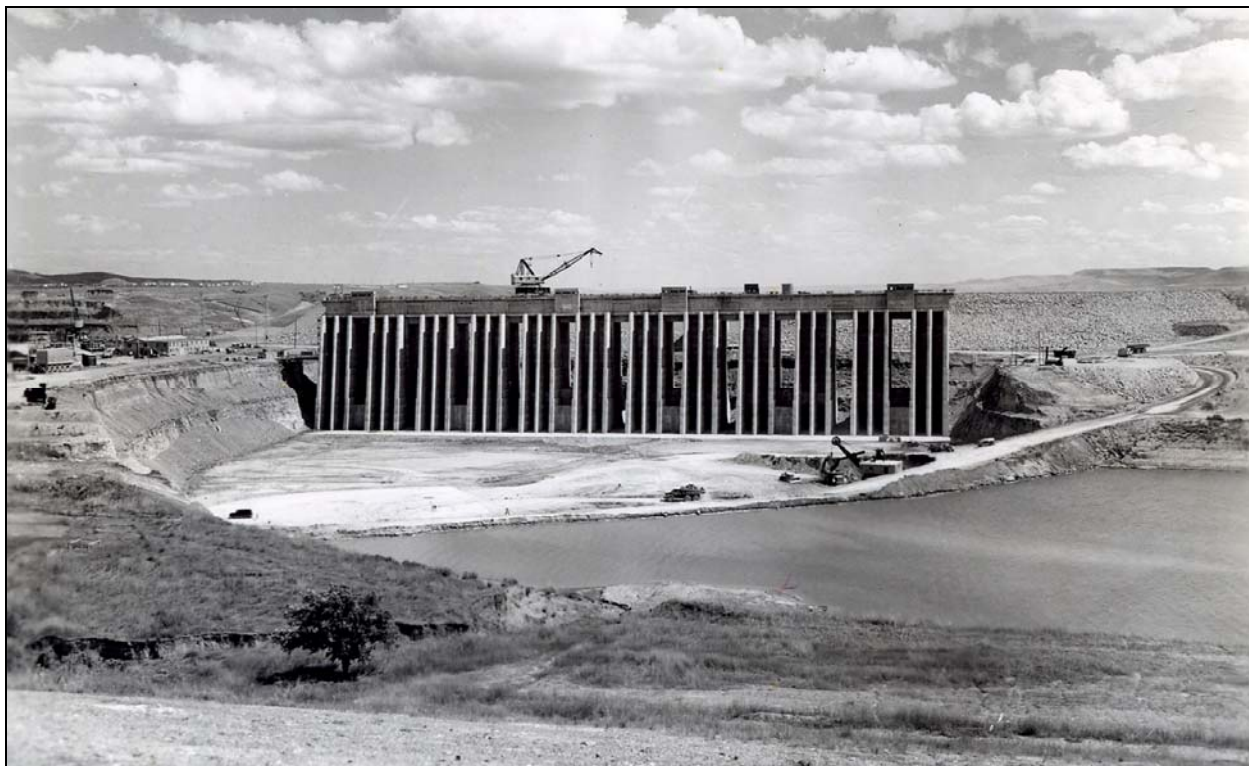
General view of upstream face of intake structure at Fort Randall Dam, after final cleanup of approach area, and before release of water through river plugs in the coffer dam (*Photo Date: 27-May-1952*).
